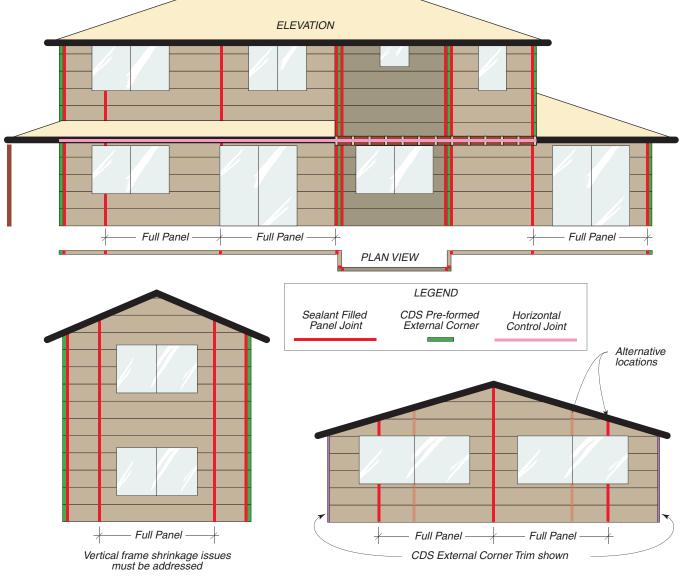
Typical Layout of Vertical & Horizontal Panel Joints - Horizontal Cladding
